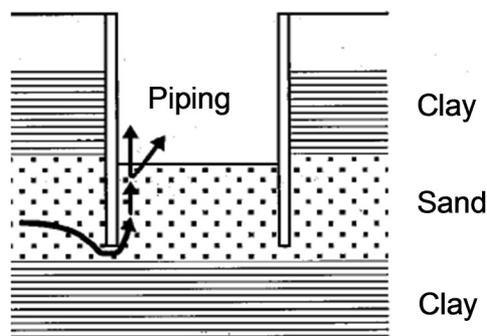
Inflow caused by shortage of installation depth of cut-off wall
